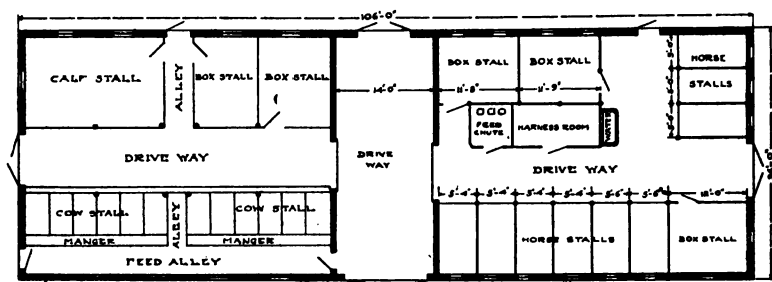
This floor plan shows the convenient arrangement of the Hill Farm barn.
